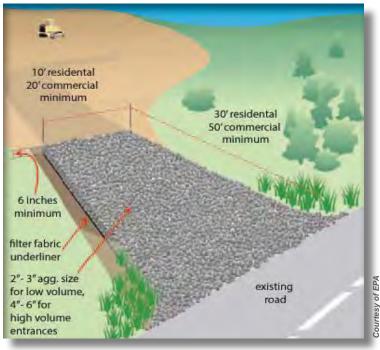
Construction Entrance Detail for Proper Installation
